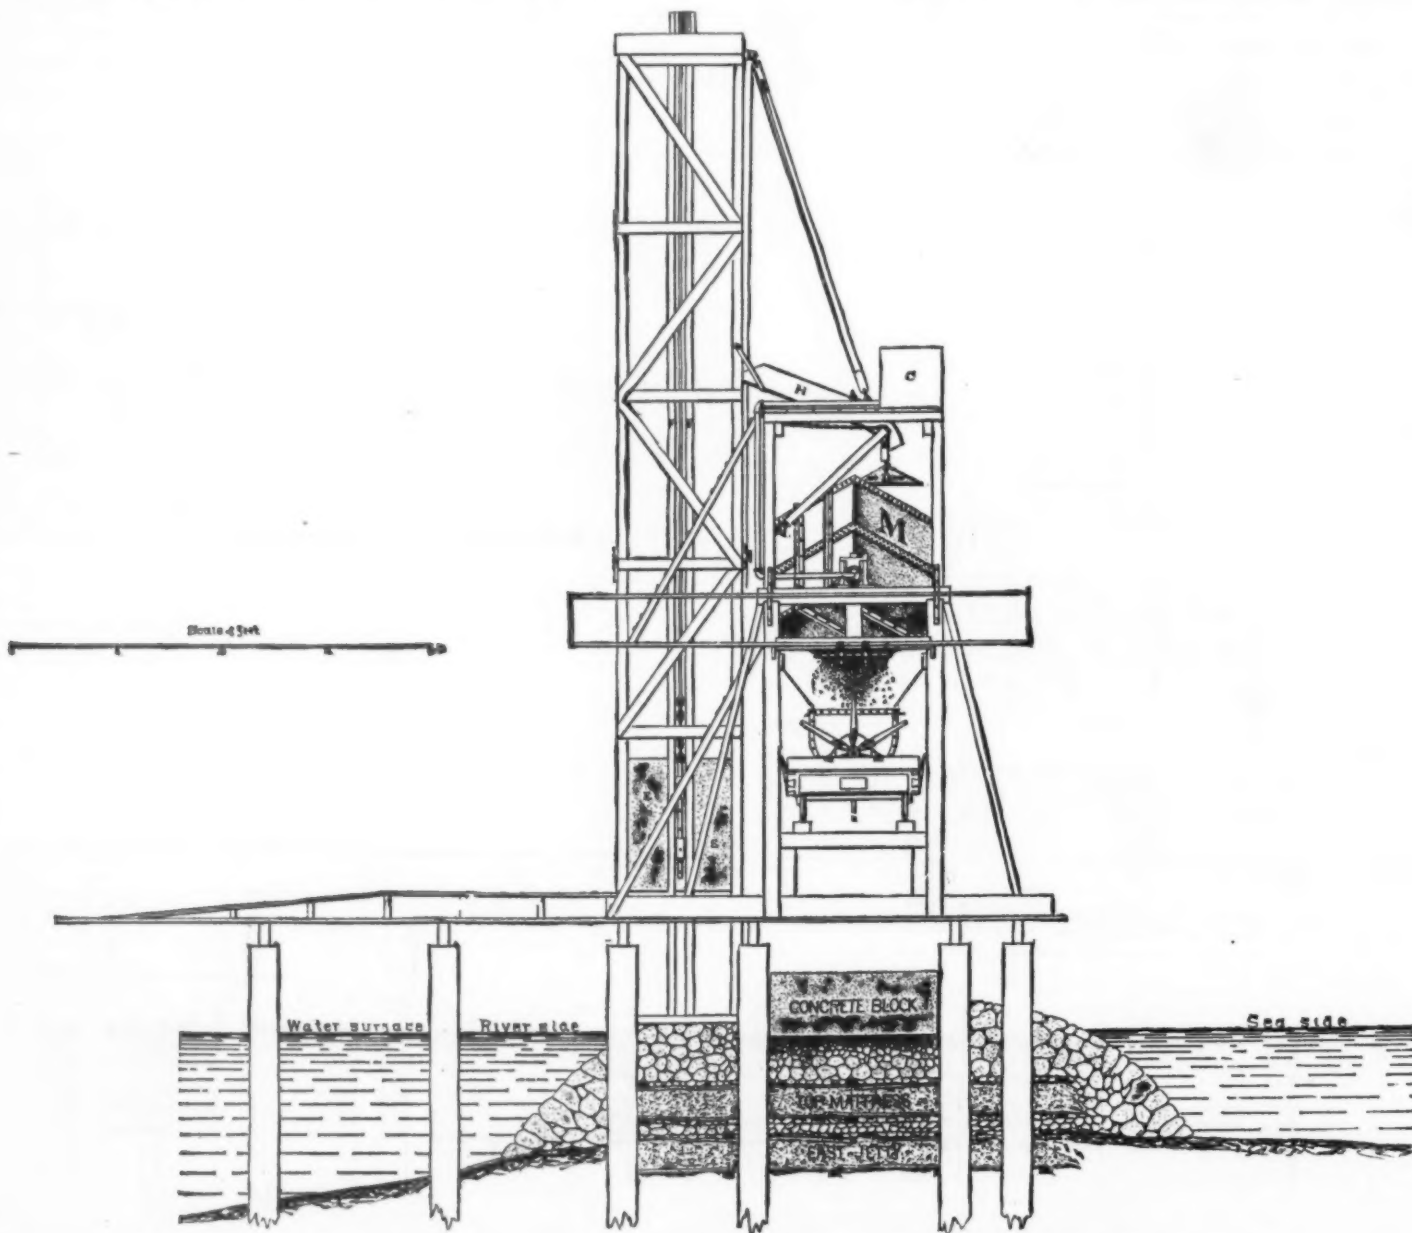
PLATE VII.—CONCRETE MIXER ON EAST JETTY.—END ELEVATION, LOOKING NORTH.
